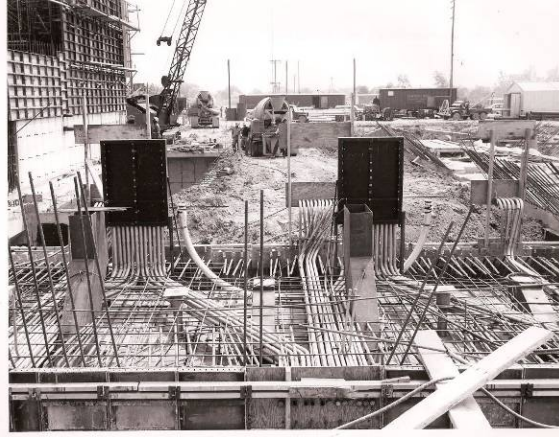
Construction photo showing conduit in floor of Hot Cells #4 and #5. The bottom center of the photo shows the access location used for cleaning.
